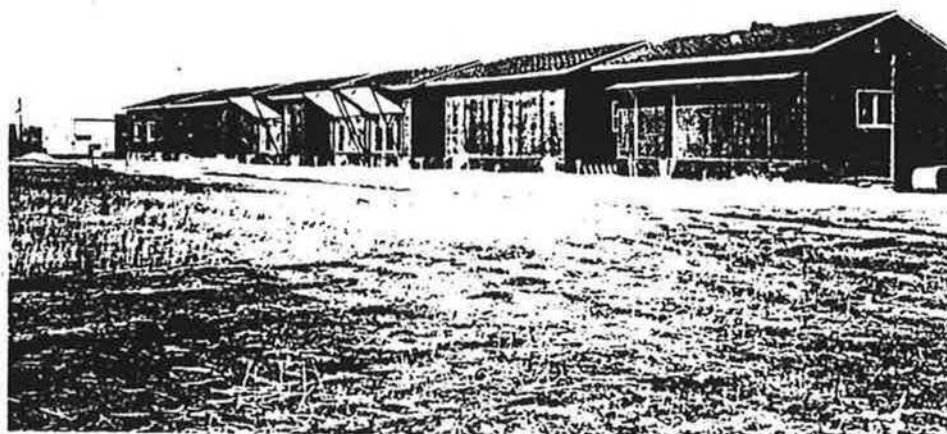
Houses 5 and 6 at AHHRF showing building orientation and false end wall.
